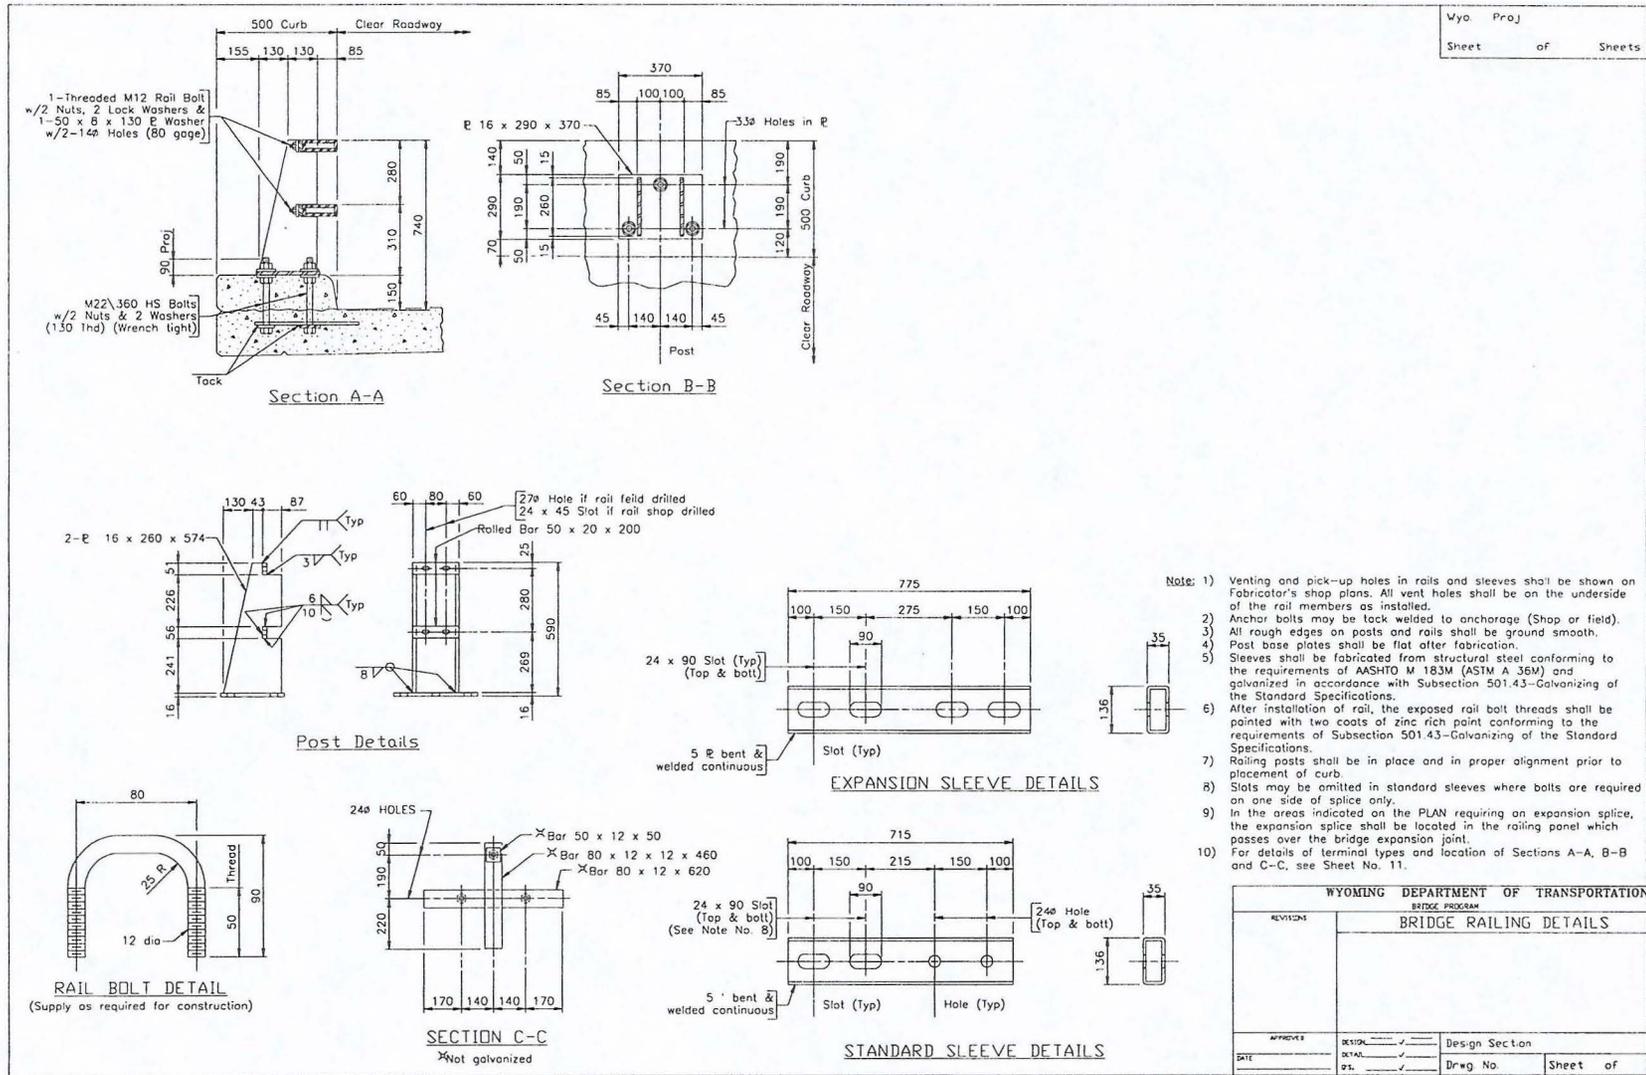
Details of the Wyoming 740WYBRIL bridge railing design.
